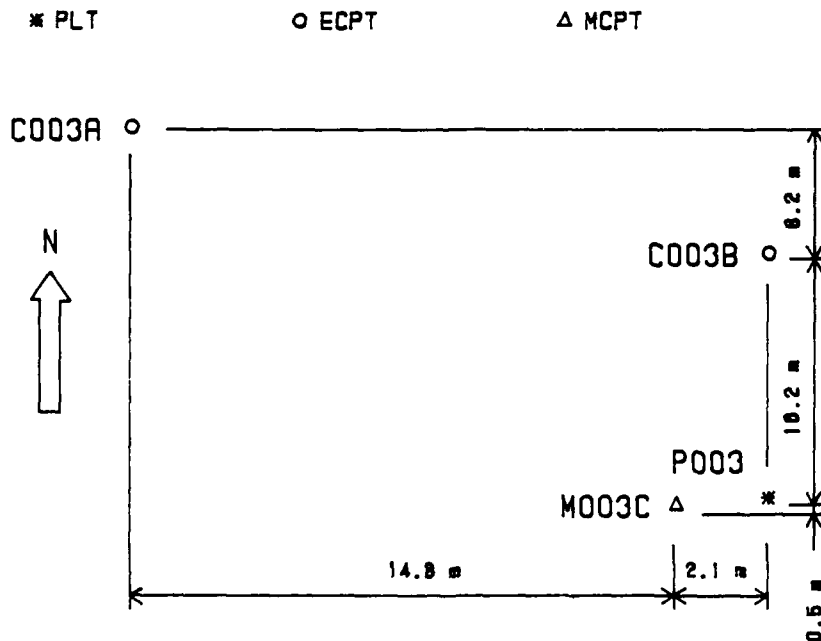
Apalachicola Bay Bridge Flat Slab Bent 22 Tests
